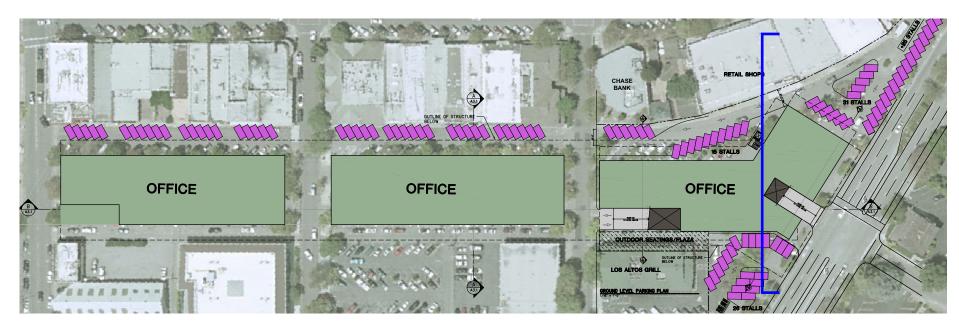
Public-Private Test Case C—Plan of Three Office Buildings on Parking Plazas 1, 2 and 3
